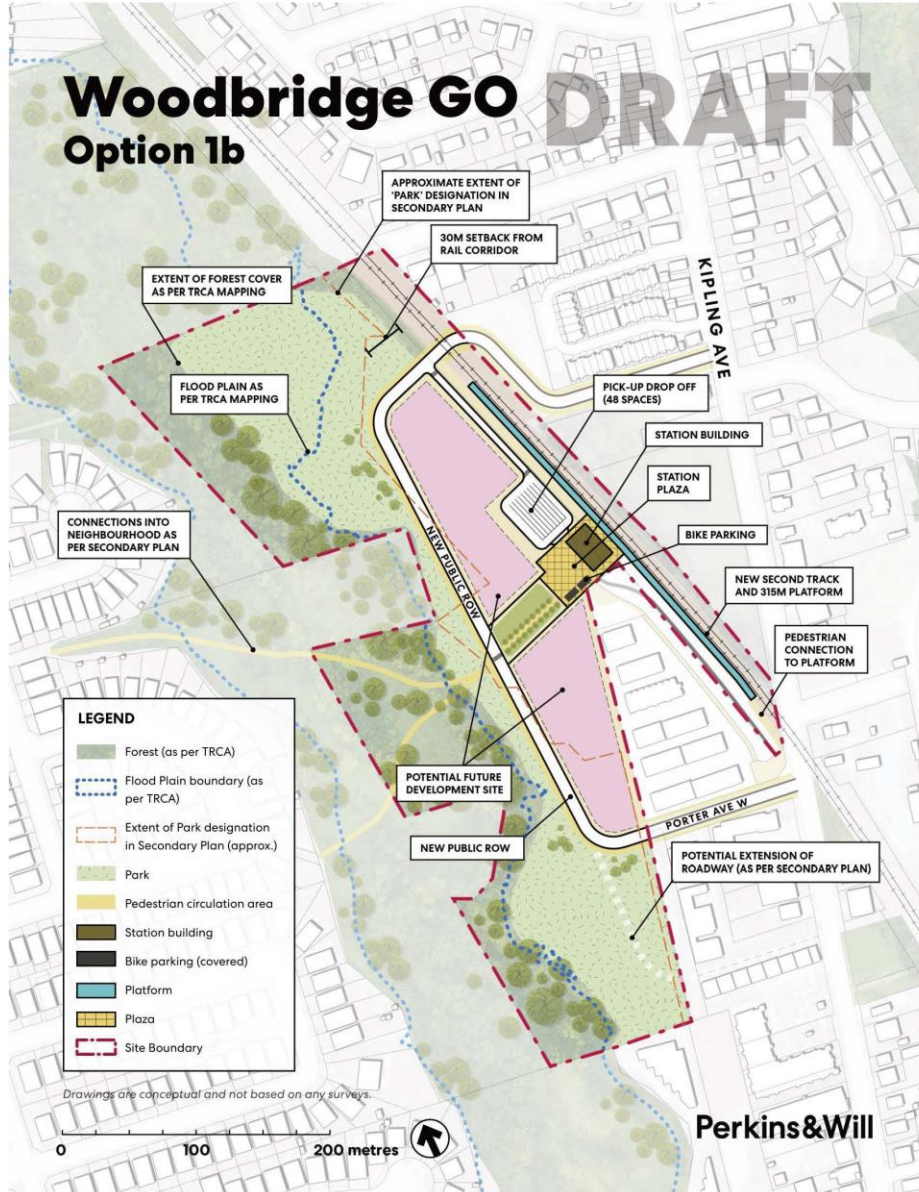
Option 1b conceptual plan for Site 1 and Woodbridge GO Station
